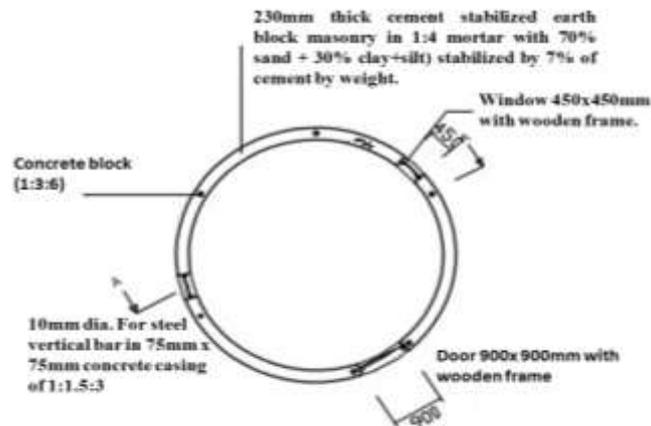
typical plan Stabilized compressed earthen block Bhunga.
